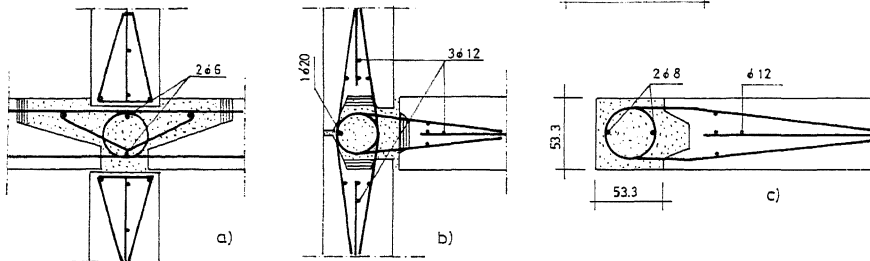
Detail of monolithic connections. a) Horizontal connection of vertical panels and floor slabs
